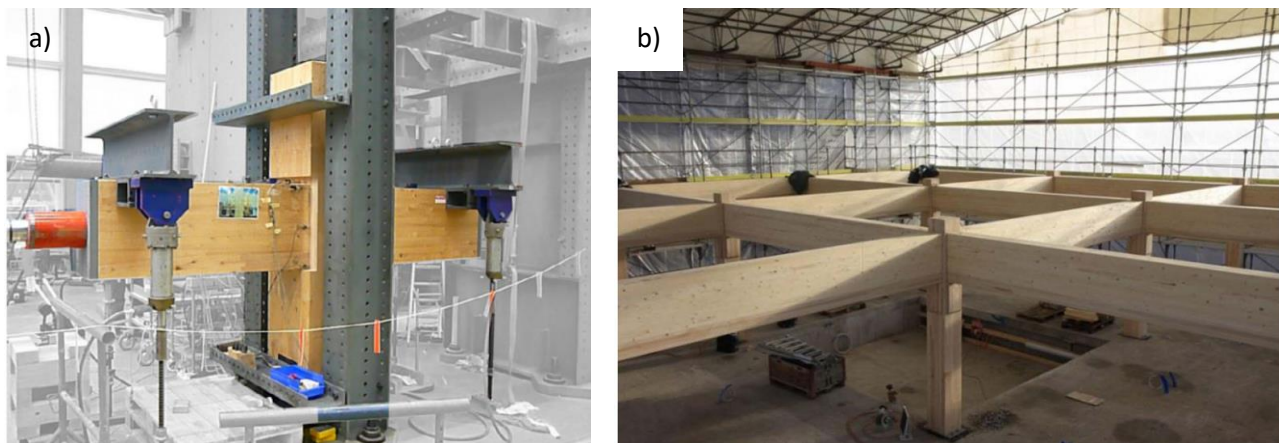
Glulam column-beam specimen; b) first elevation of the ETH House of Natural Resources [169]
